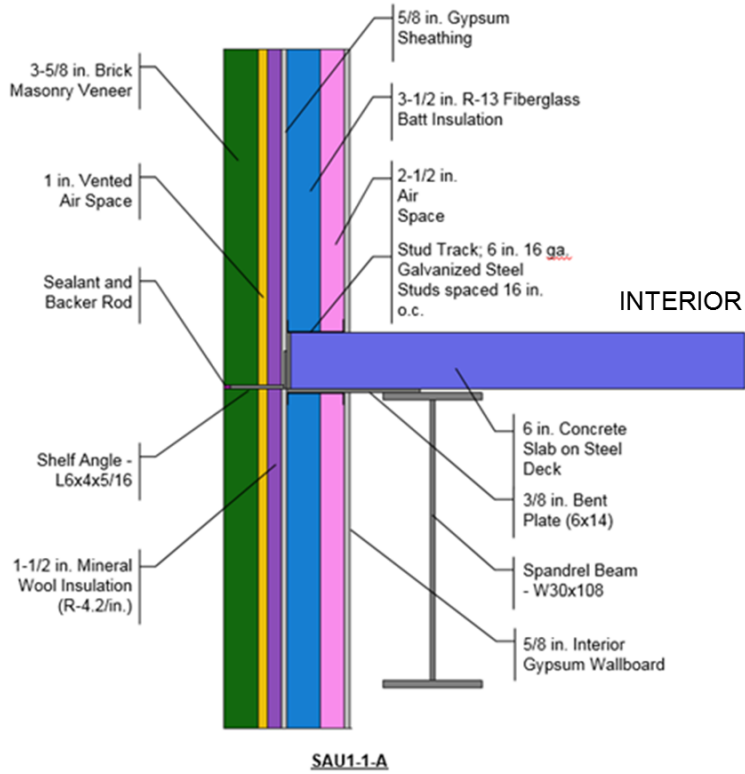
Section view of an unmitigated slab-supported shelf angle specimen SAU1-1-A in climate zone 1 (2.5" cavity width)
